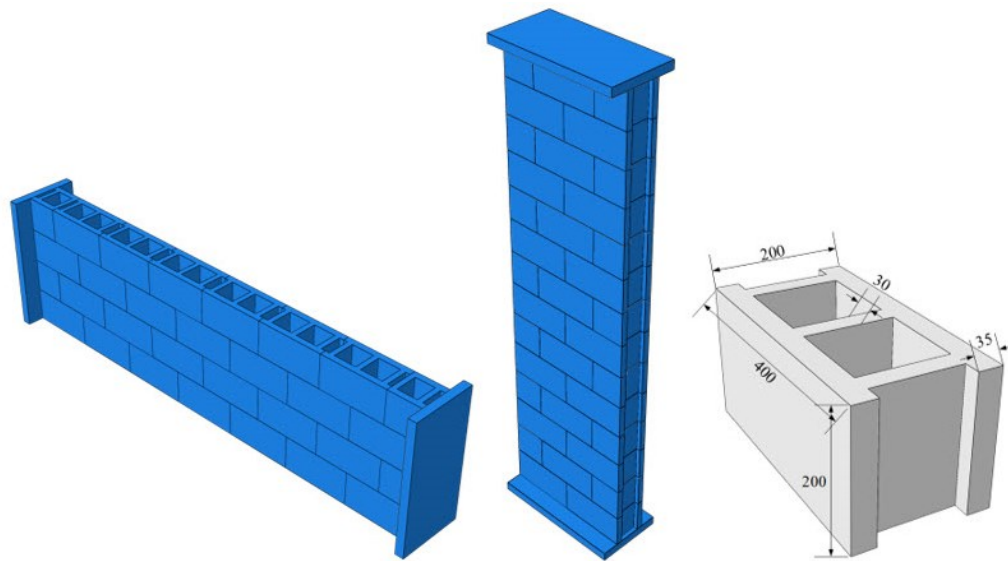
Geometric configuration of vertical and horizontal strips and masonry block dimensions
